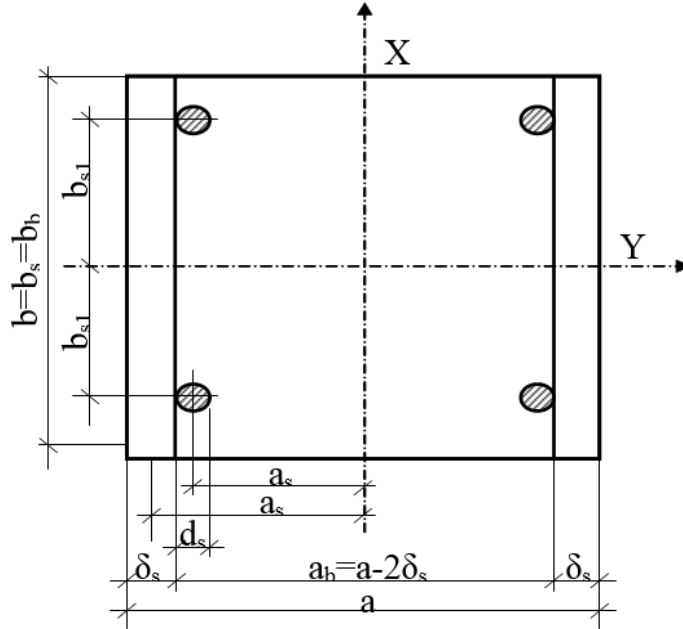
Cross section of the steel reinforced concrete element with sheet reinforcement
